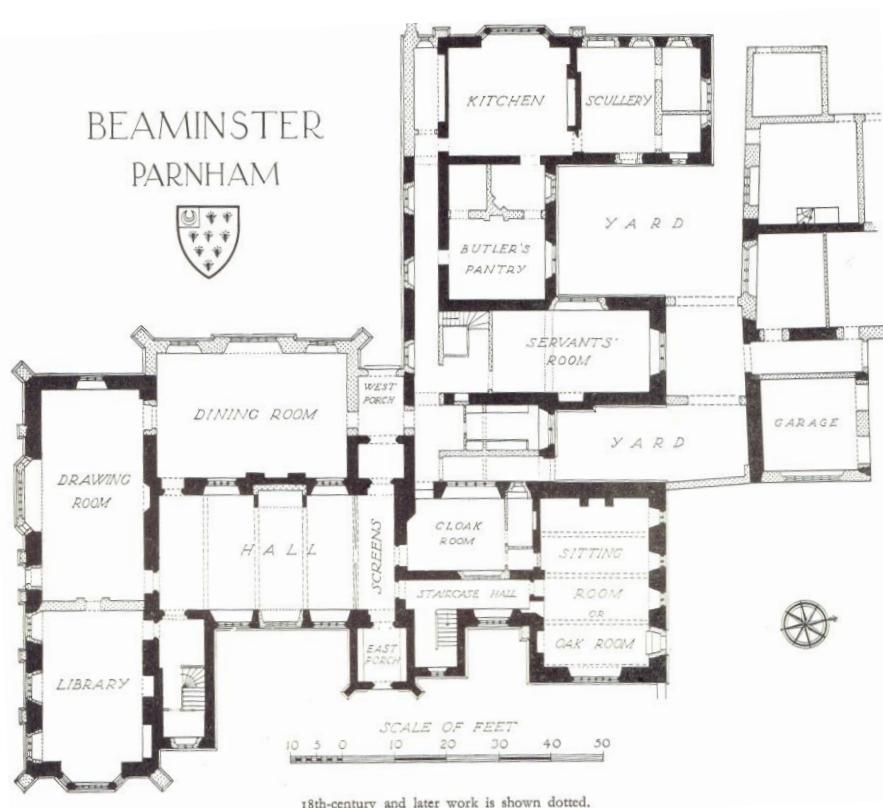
Ground Floor Plan of Parnham House c.1952 with the remodelling by Nash identified © RCHM.
